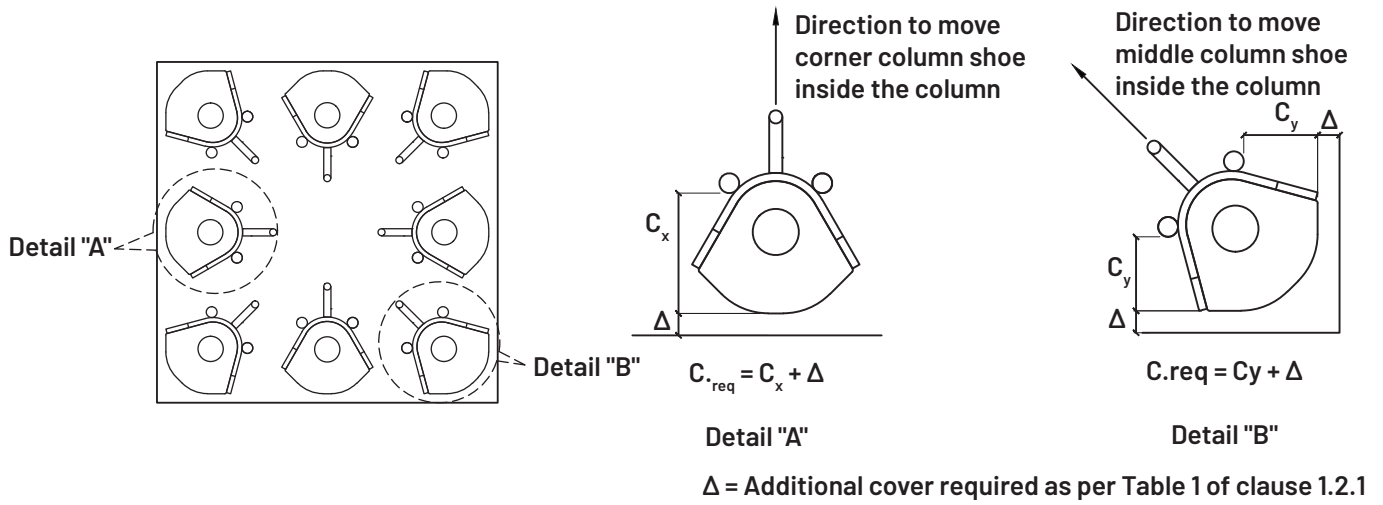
Required Concrete Cover for Main Bar of Column Shoe
